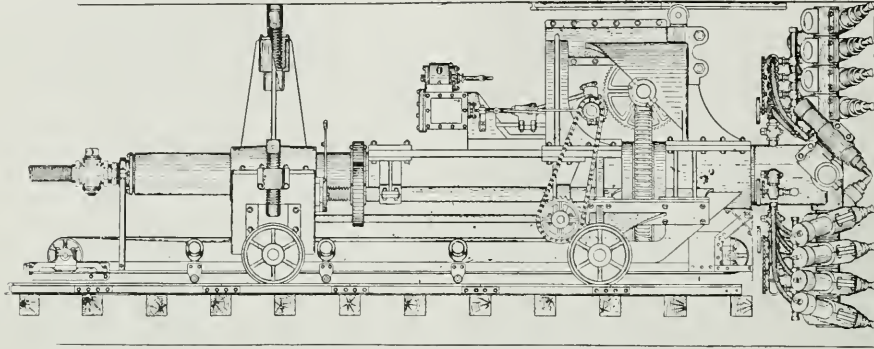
Side View of 8-ft. Tunneling Machine.
